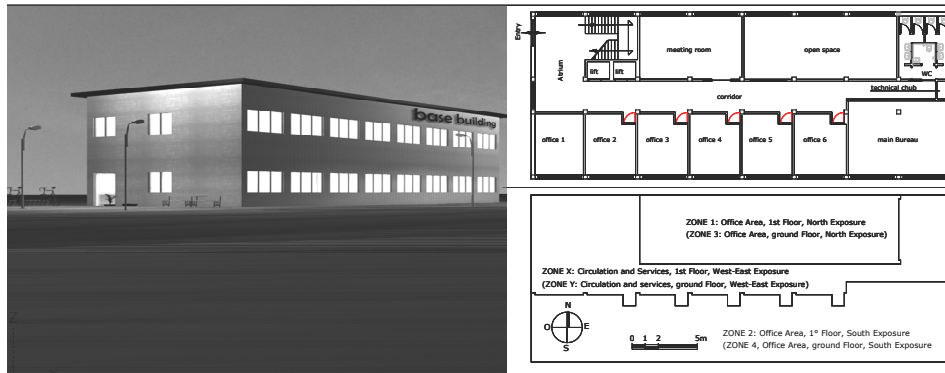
The modelled building; plan, thermal zones and volumetric scheme
